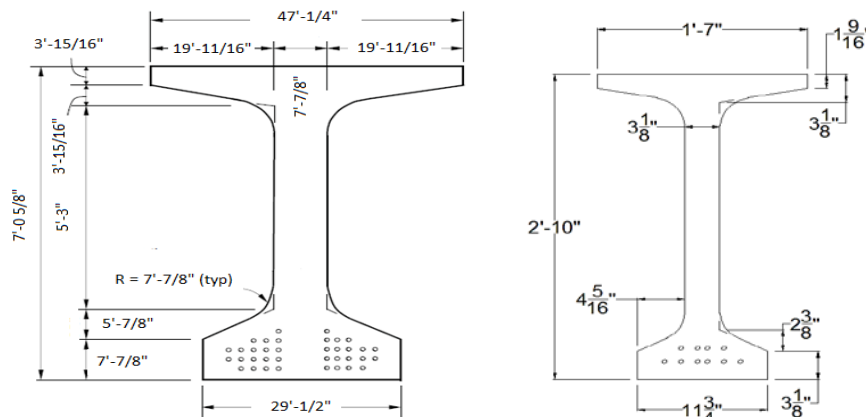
Cross-sections of prototype girder (left) and scaled test unit girder
